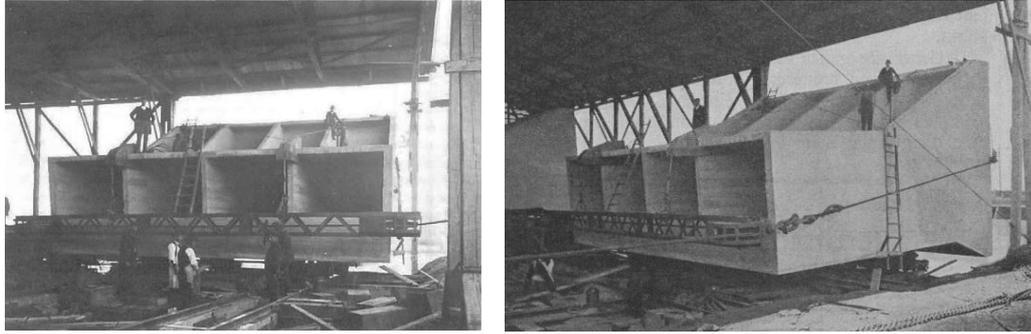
Caisson construction for Talcahuano, Chile (1908). Source: *Wonderen der techniek: Nederlandse ingenieurs en hun kunstwerken : 200 jaar civiele techniek (Dutch Edition)*, Walburg Pers, Zutphen, 1994
